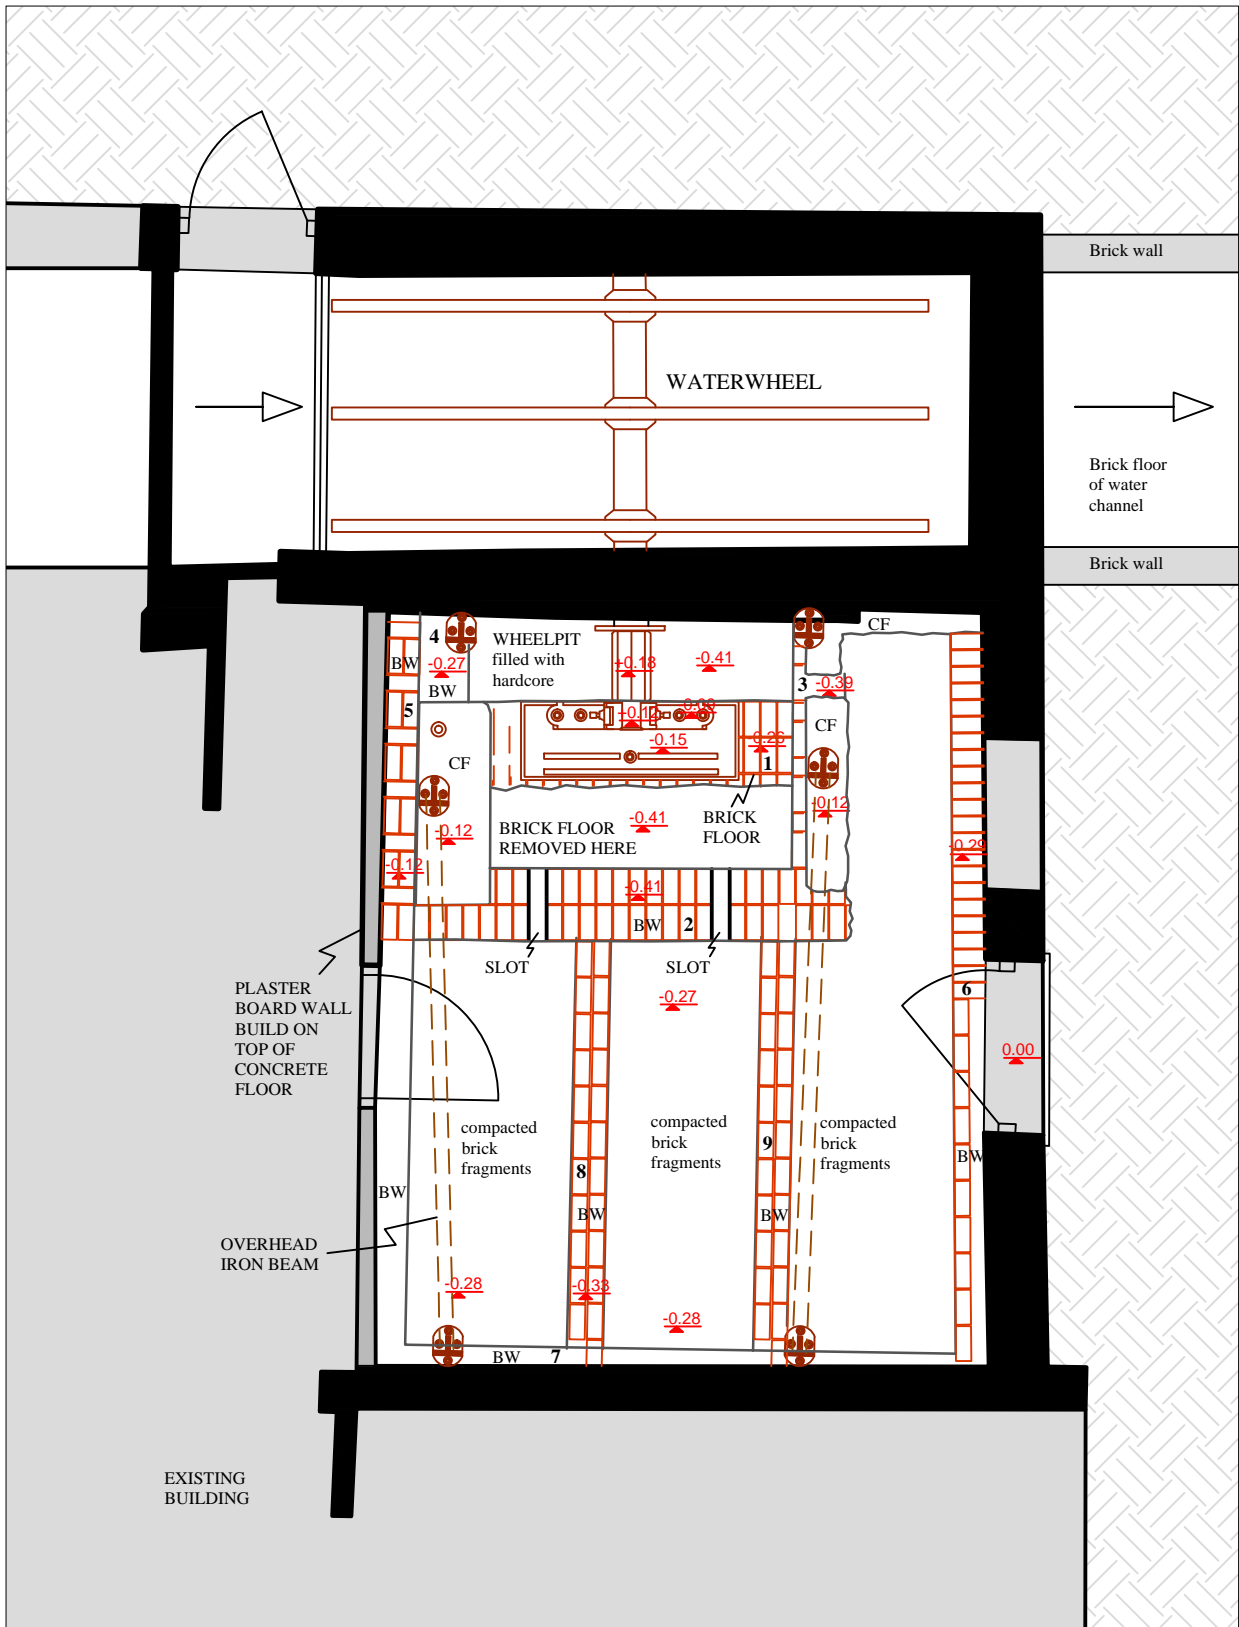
Plan of exposed foundation walls, iron frame and fittings of iron mechanism.
